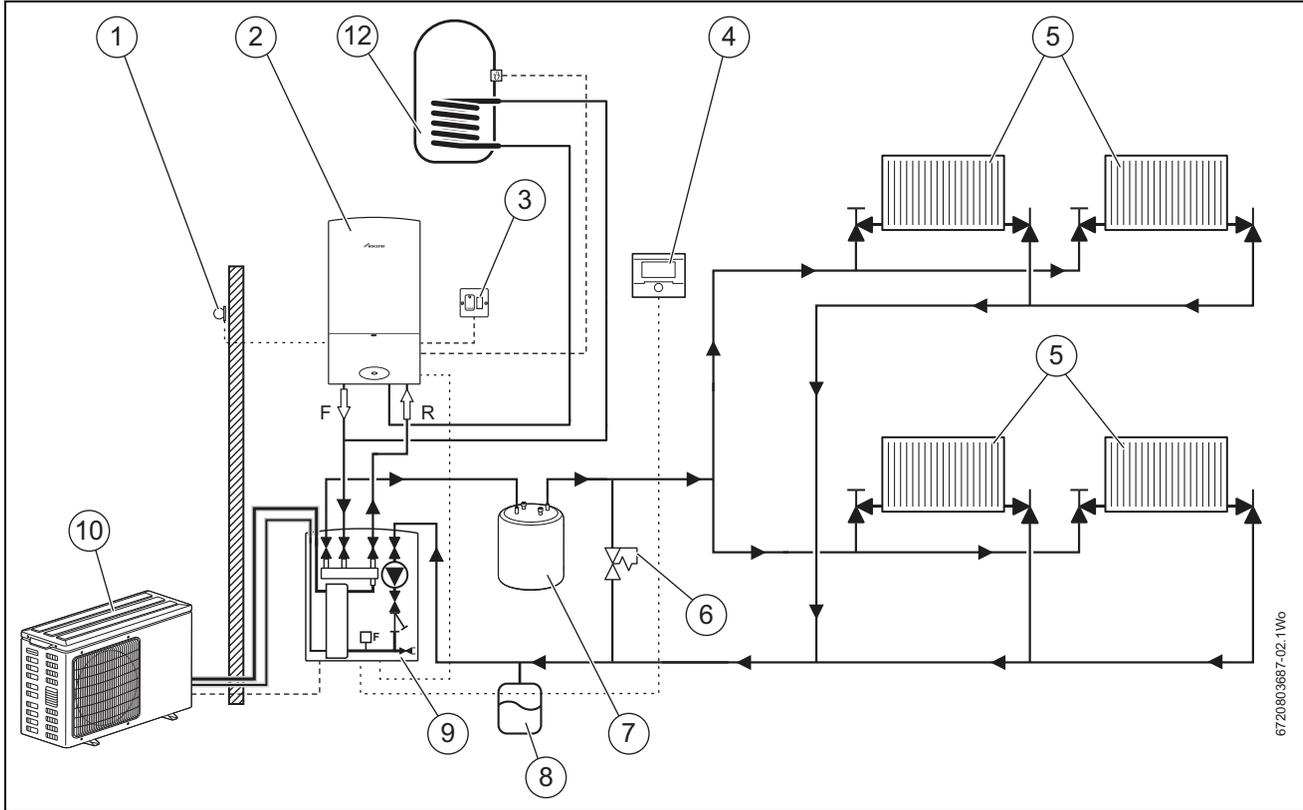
System scheme with serial buffer tank, bypass valve and one unmixed heating circuit
